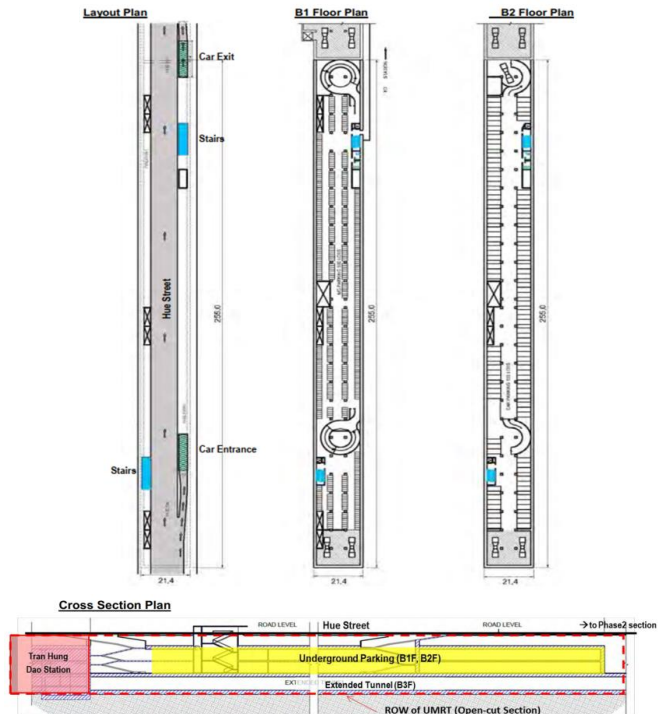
Tran Hung Dao underground car parking' Facility Plan
